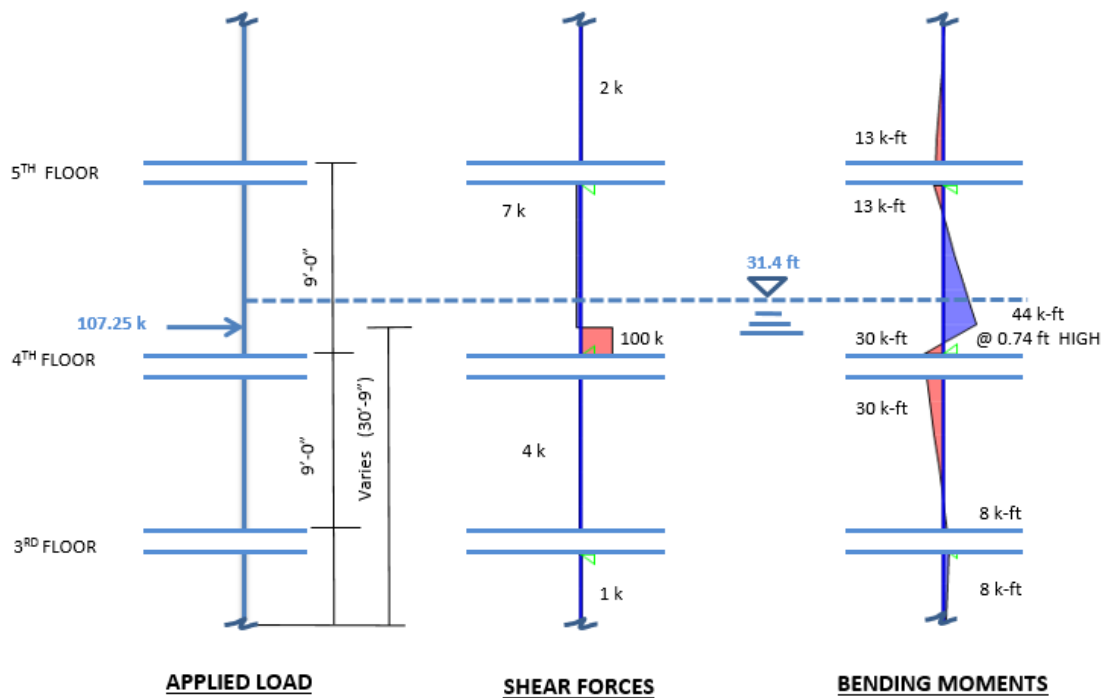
Impact load applied at d away from the end of column on the 4th floor
